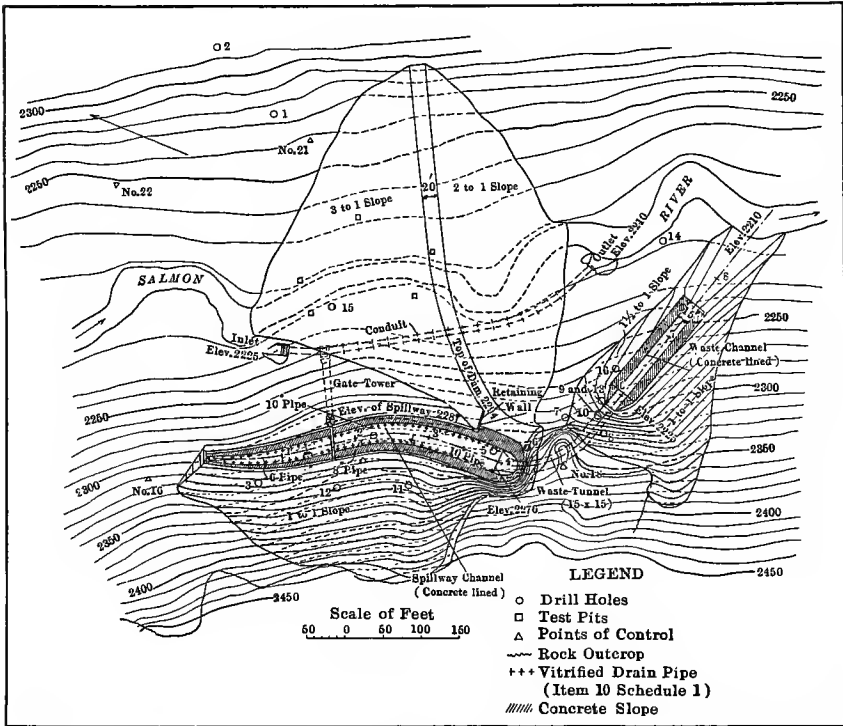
General plan of Conconully Dam, showing location of spillway and outlet works, Okanogan Project, Washington.
